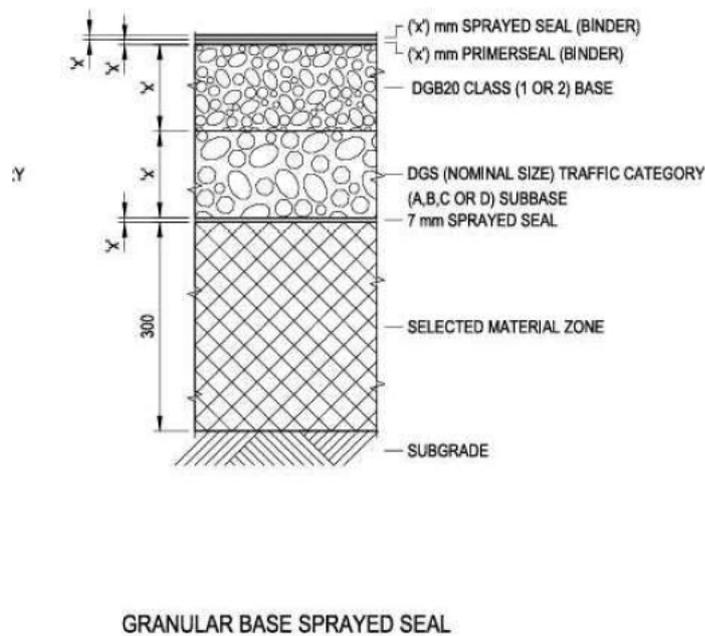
Typical pavement profile of a granular pavement with a bitumen sprayed seal (Source: TfNSW, 2021)
